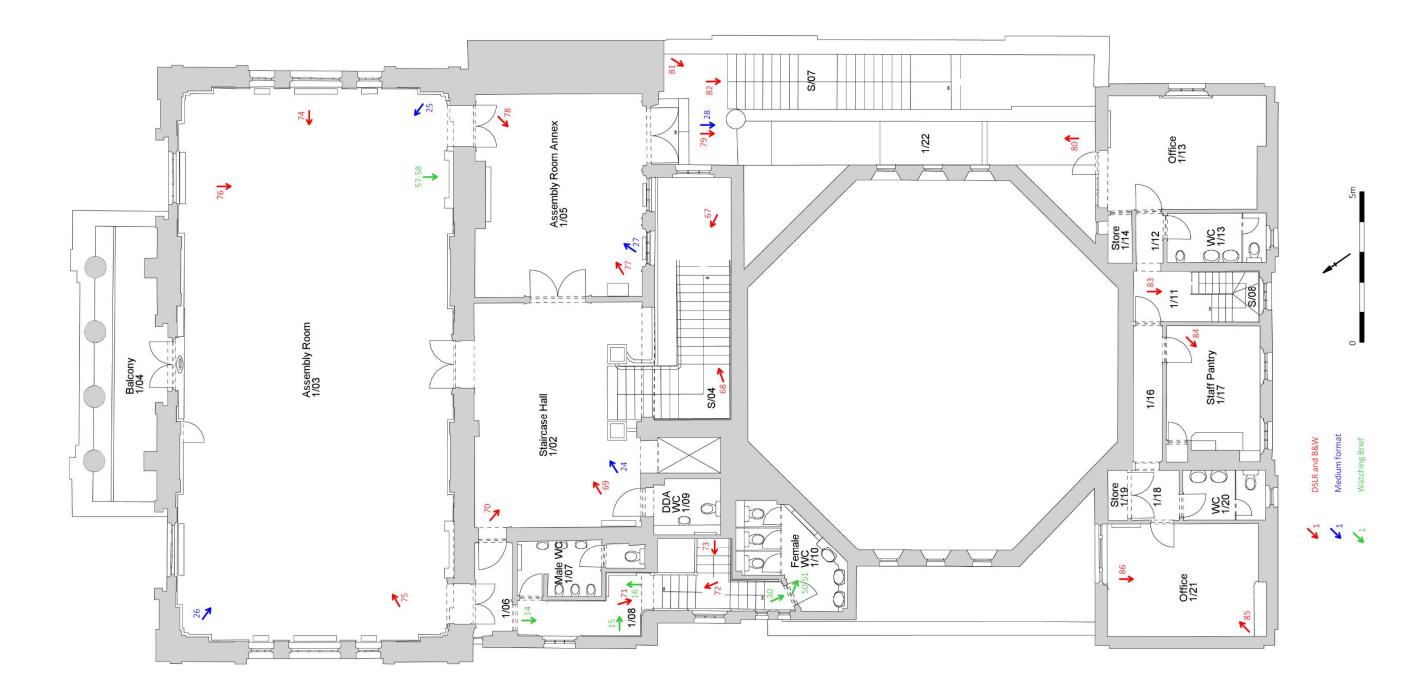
First floor building survey and Watching Brief photo plan (scale 1:125)
